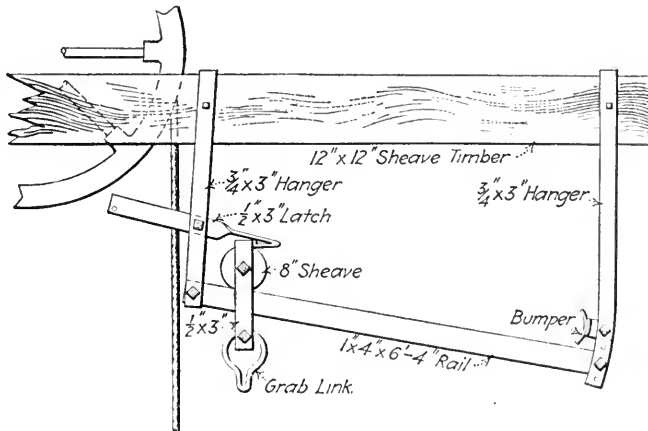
TROLLEY HOOK FOR SINKING BUCKET.
